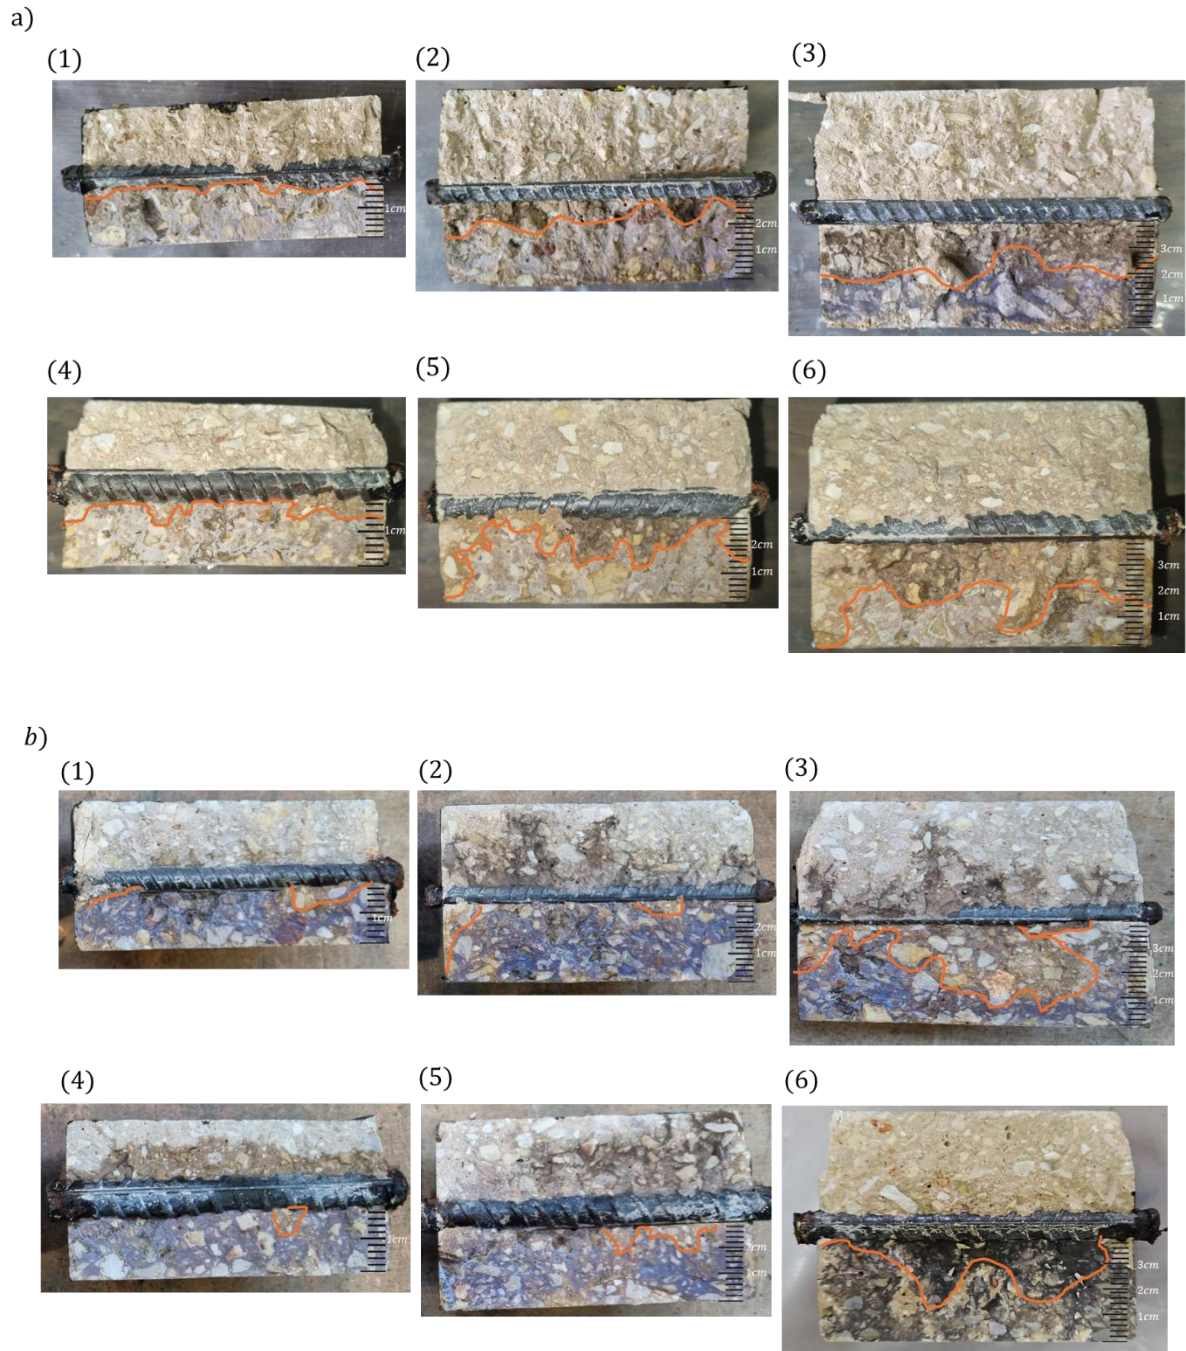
Results of the colorimetric test in fresh cross-sections of reinforced concrete specimens: a) Concrete Grade 60; b) Concrete Grade 30; (1-3) - specimens with 8-mm diameter steel rods; (4-6) - specimens with 12-mm diameter steel rods
